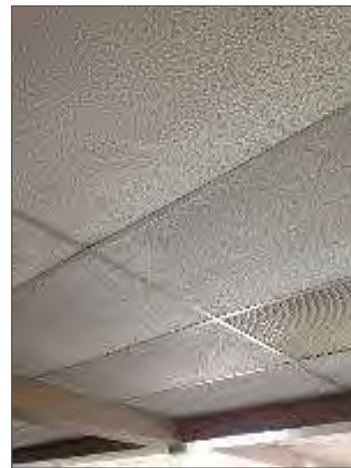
Non-asbestos 24" x 48" lay-in acoustic ceiling tiles in the 2nd level classroom area.
